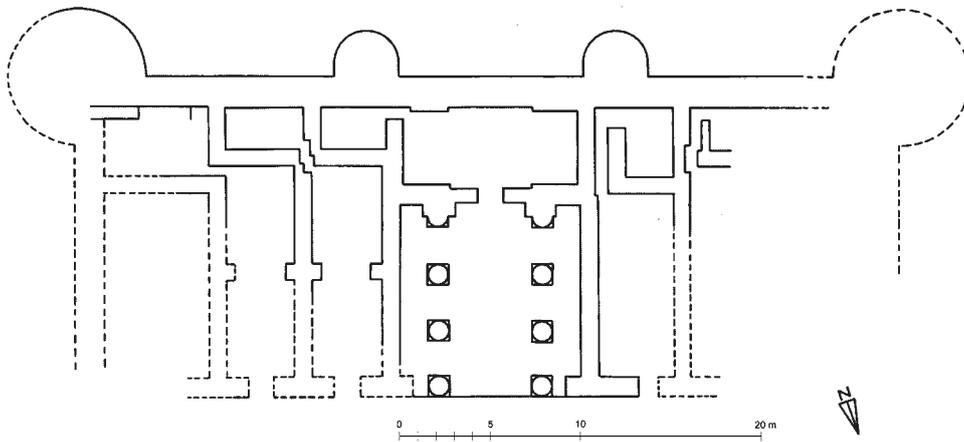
Qasr Muqātil (Tulūl al-Ukhayḍīr), ground plan of excavated south wing, partly reconstructed. – (After Finster/Schmidt, Muqatil fig. 5. New scale).
